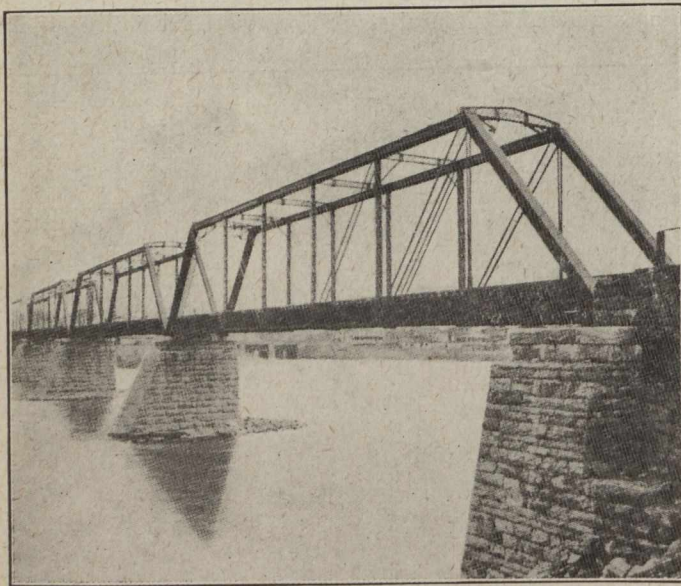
153-ft. Span Pin-connected Trusses. Typical of 1890 Construction.
